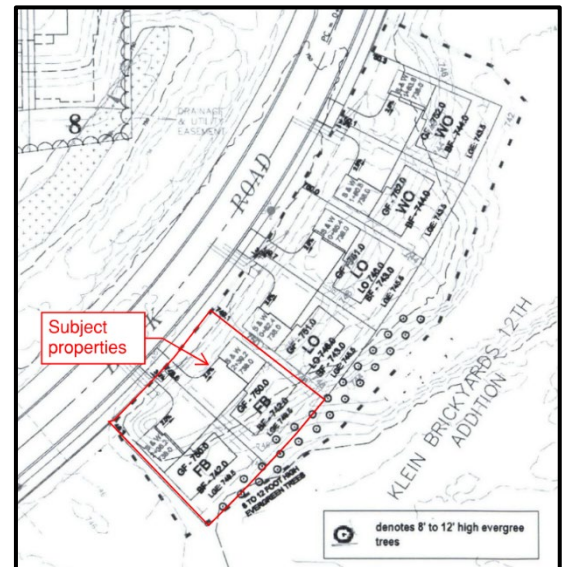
Klein Brickyard 13th Addition - Landscaping Plan
